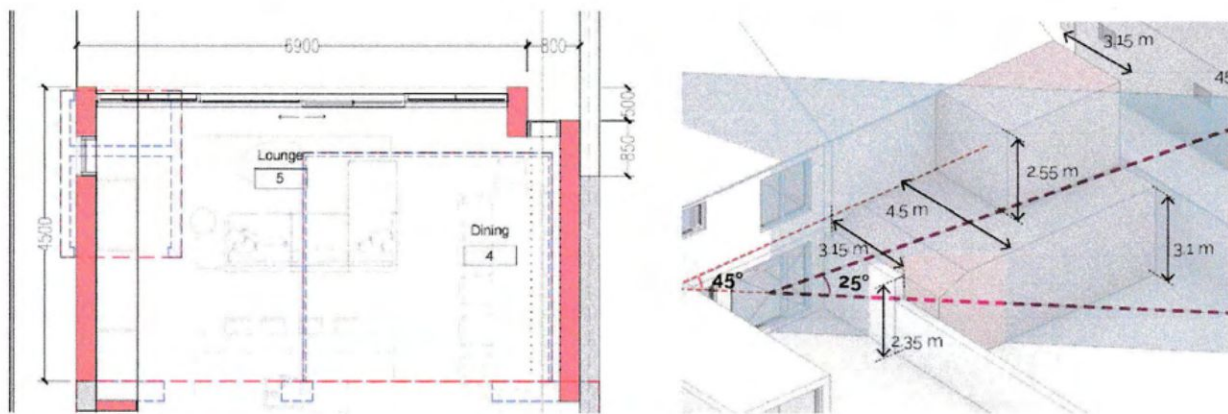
Proposed Ground Floor Plan of Rear Extension and Axonometric view.
